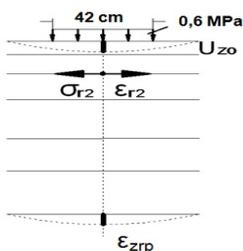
Calculation scheme of pavement structure and subgrade of highway
